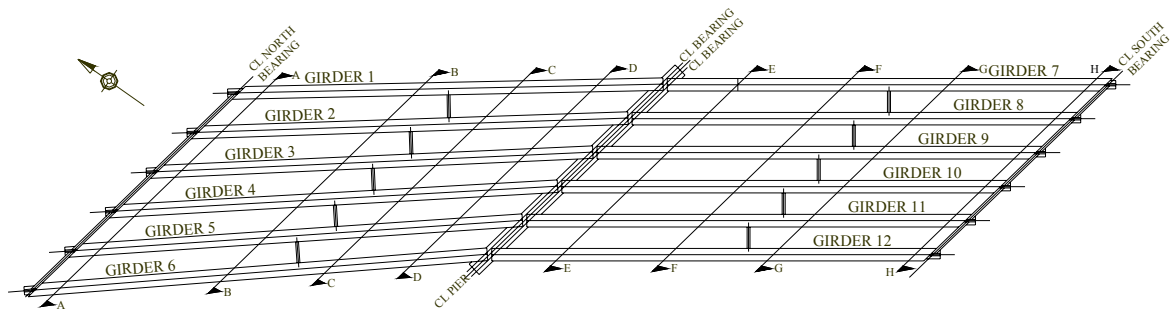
Instrument Locations on Bridge Plan View (Bennett 2004).
